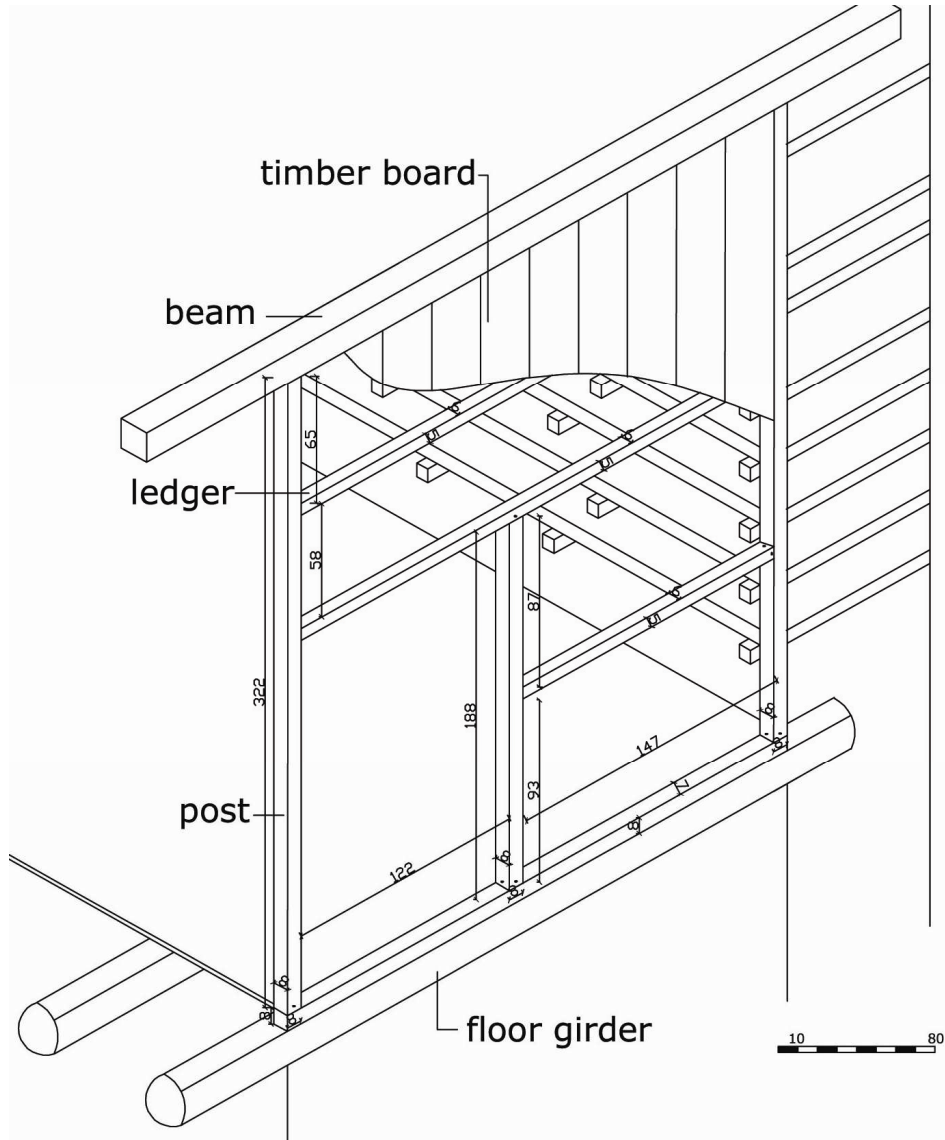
18 Drawing of the timber wall type 2. Çelik 2008.
